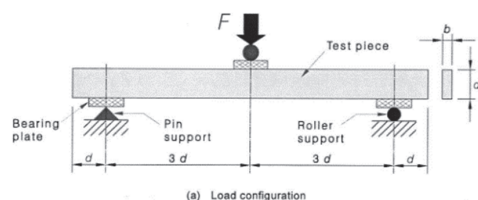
AS/NZS 4063.1 Section 2.7: 3-point bend test setup
